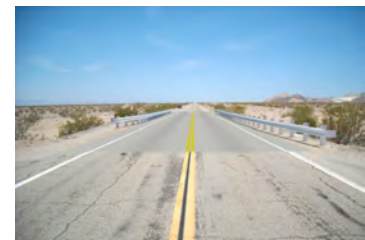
Simulation showing proposed 'W' shaped guardrail painted white (courtesy of San Bernardino County DPW); note post caps will also extend above the 'W' beam
